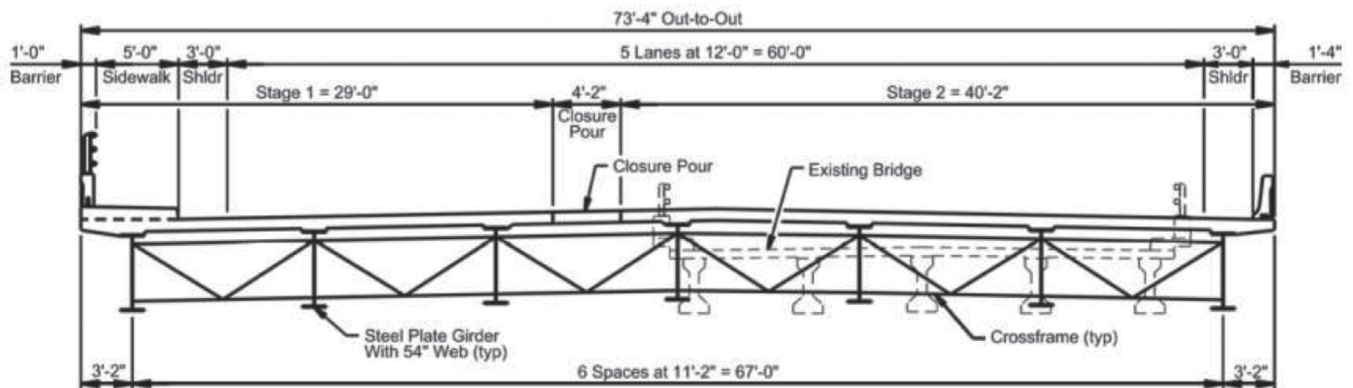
Three Springs Drive typical section. Washington Avenue is similar with 45-in.-deep girders and bent plate diaphragms.
